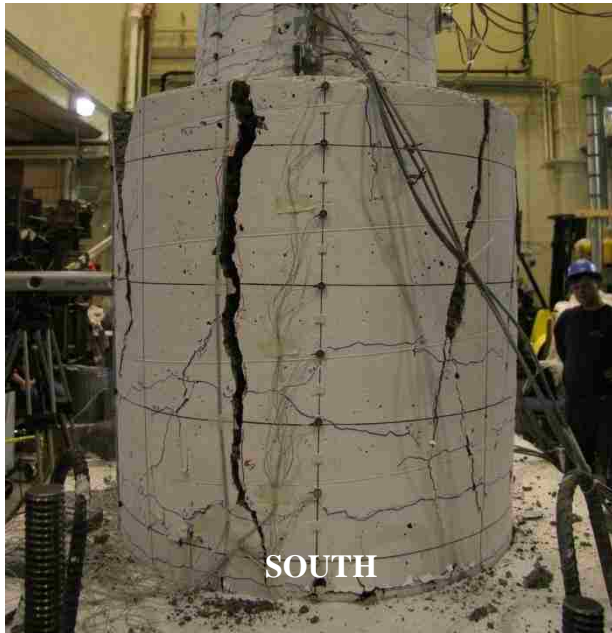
DS-2 – Shaft damage after cyclic testing
